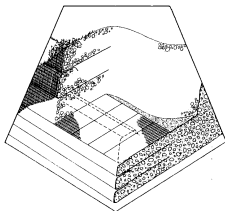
Proposed model of rolled-up type stretch-made polymer grid (SR-Type) reinforced embankment (1984)
